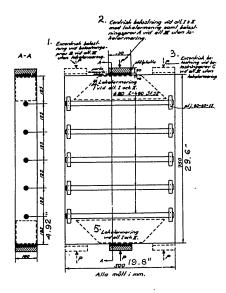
Reinforcement and Dimensions in the Test of Partial Compression
